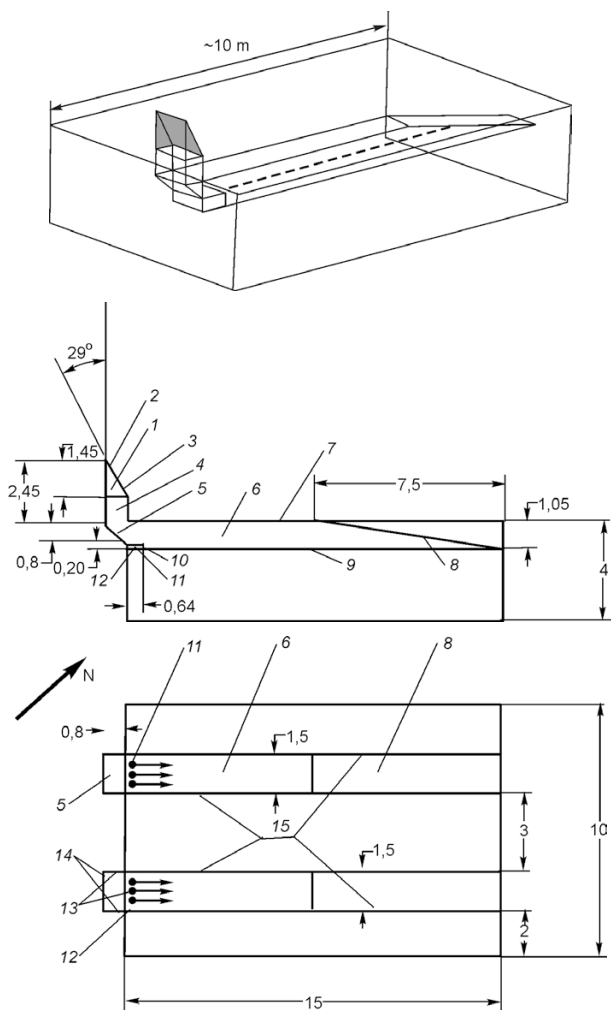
Integral lighting system for open space rooms (with back walls located at 10 m distance from windows). All dimensions in m
